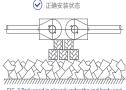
Pad wood is placed under the rod body and unidirectional hinge, and the rod body is horizontal
